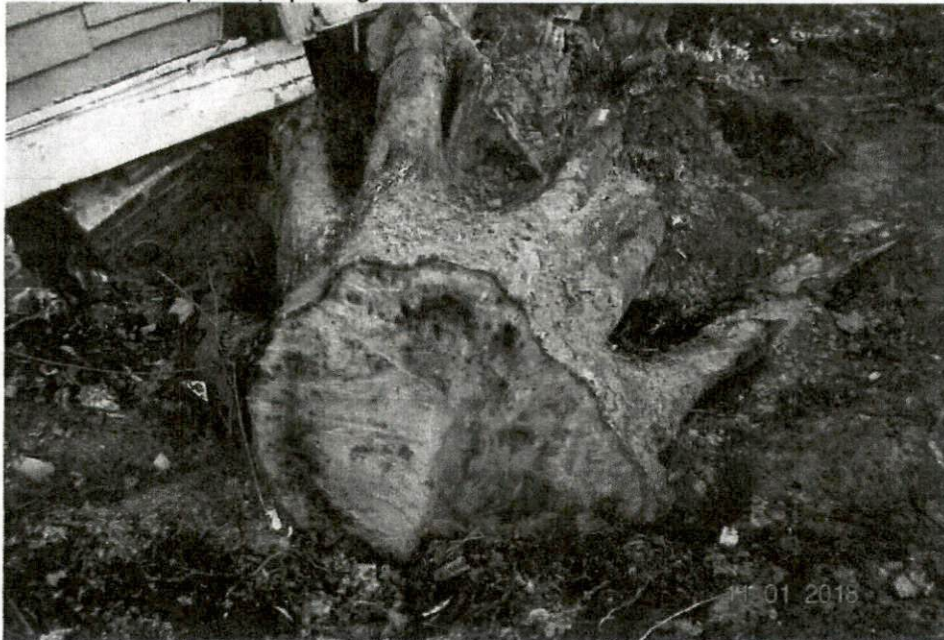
The insured risk was uplifted at the left rear corner by a large tree that was immediately adjacent to the rear wall and fell away from the house such that the root ball lifted the house framing.
